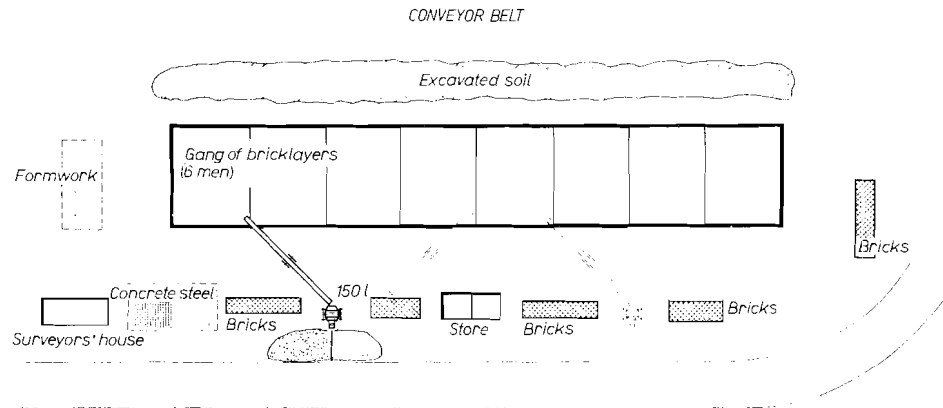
Typical arrangement of a site provided with a conveyor belt.
